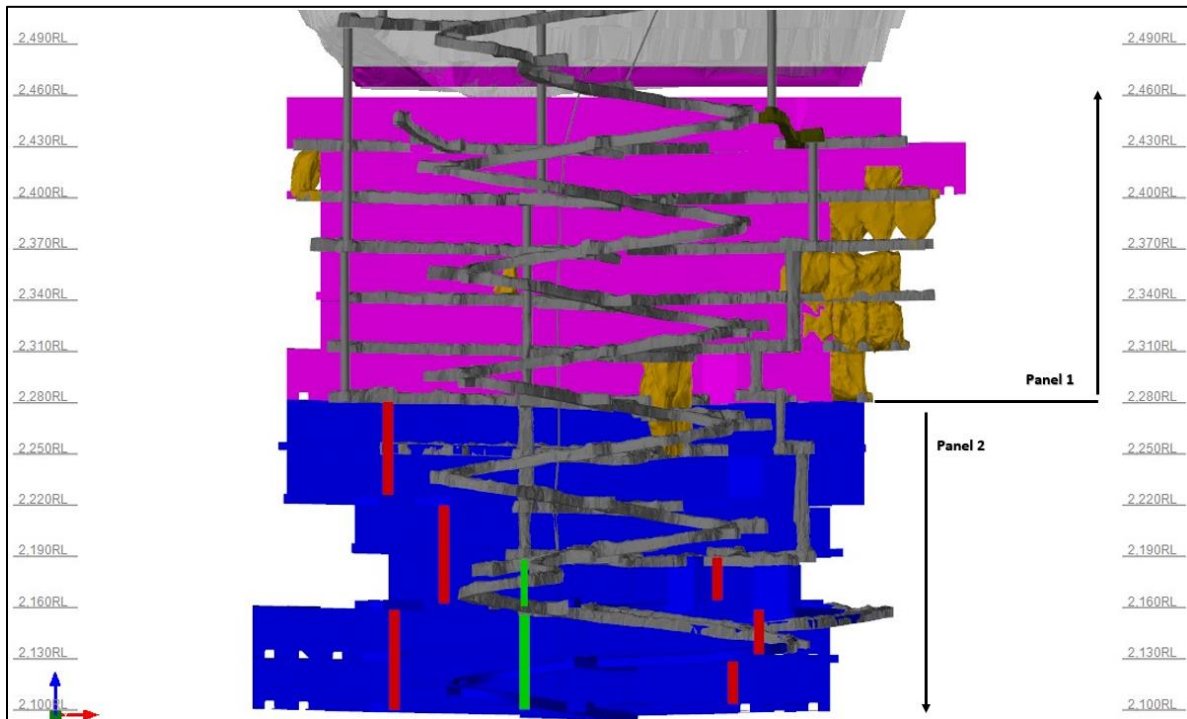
Section View Showing Split Between Panels 1 and 2
